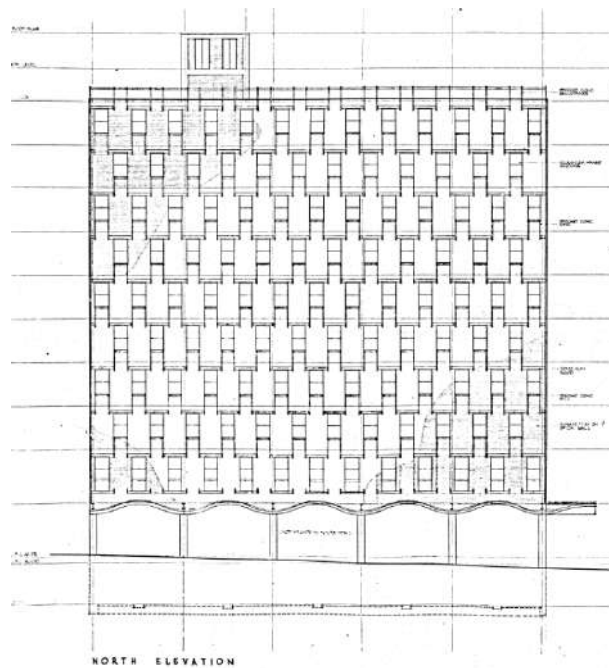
North elevation to Bourke Street. Drawing date stamped February 1963 (BAP).
